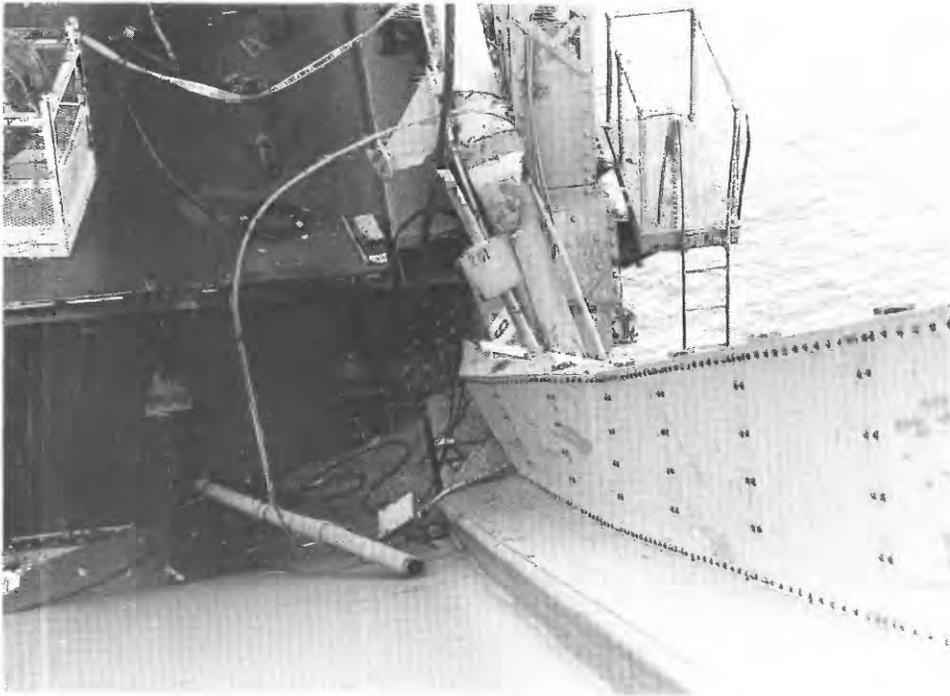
Collapsed lower deck at Pier E9 of the East Bay Crossing showing short girder seats attached to floor beam.
